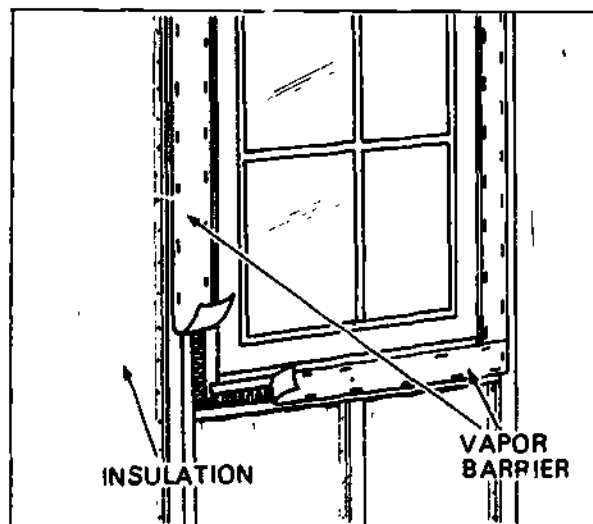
Fill all cracks with insulation and cover with vapor barrier.
